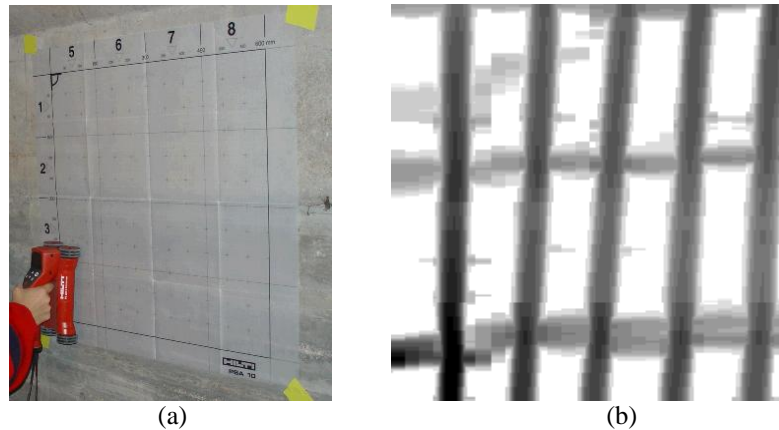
Reinforcement detection using the Hilti PS200 Ferroskan: (a) grid positioning in the web; (b) corresponding scan results. The vertical bars correspond to 12mm stirrups (12.5cm spacing) and the horizontal ones to the 10mm longitudinal web reinforcement (25cm spacing).
